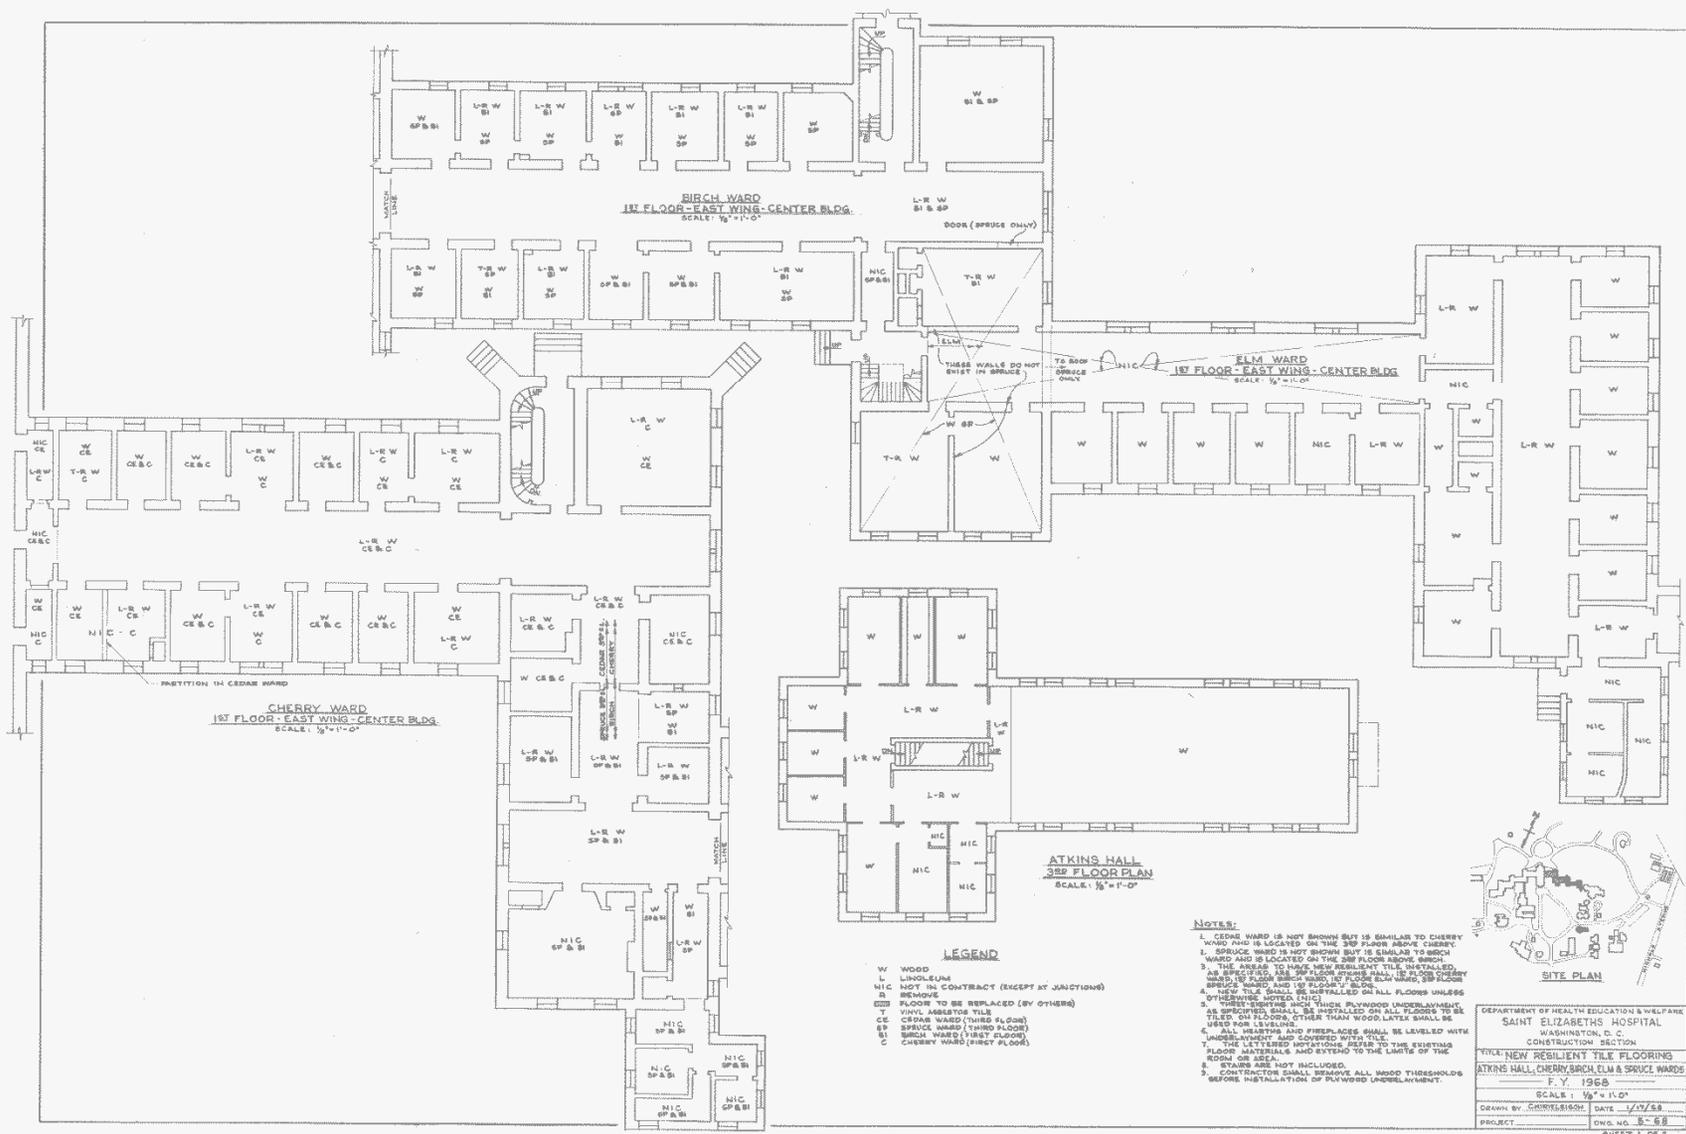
First floor plan of the East Wing outlining new floor covering installation, 1968. Source: GSA archives, image DC1343SE0104.
